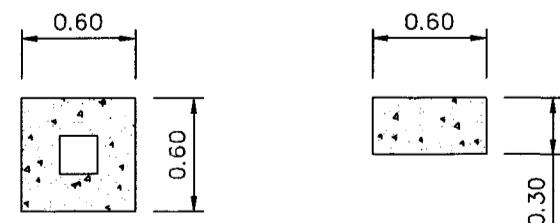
DETAIL CONCRETE POLE NO.11 (FRONT VIEW)
